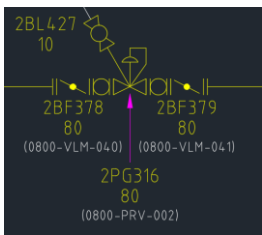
Placement of valve tags when valves and fittings are placed closely together
